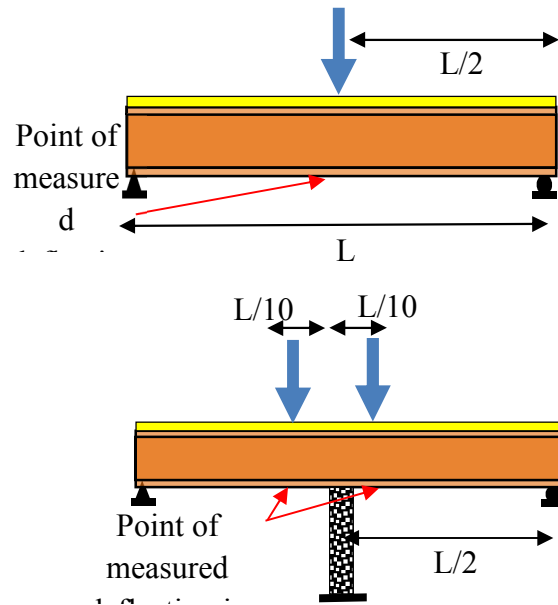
Schematic of test setup and steel-concrete beam placement in the furnace
